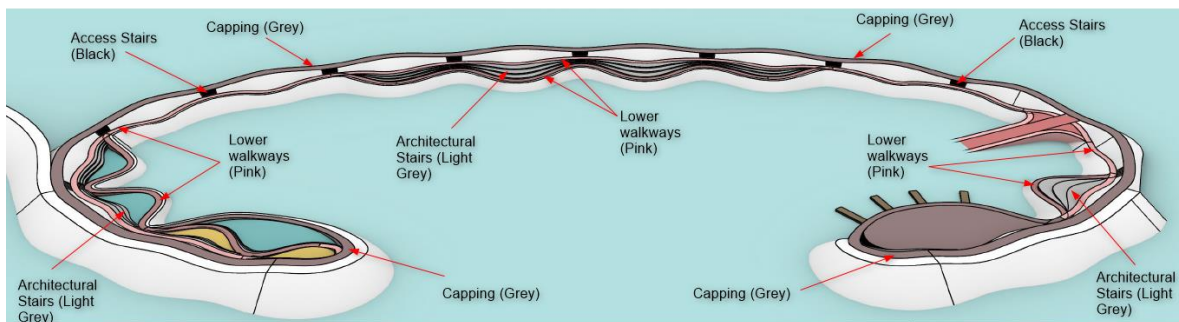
Plan View of capping, walkways and stairs identifications.
